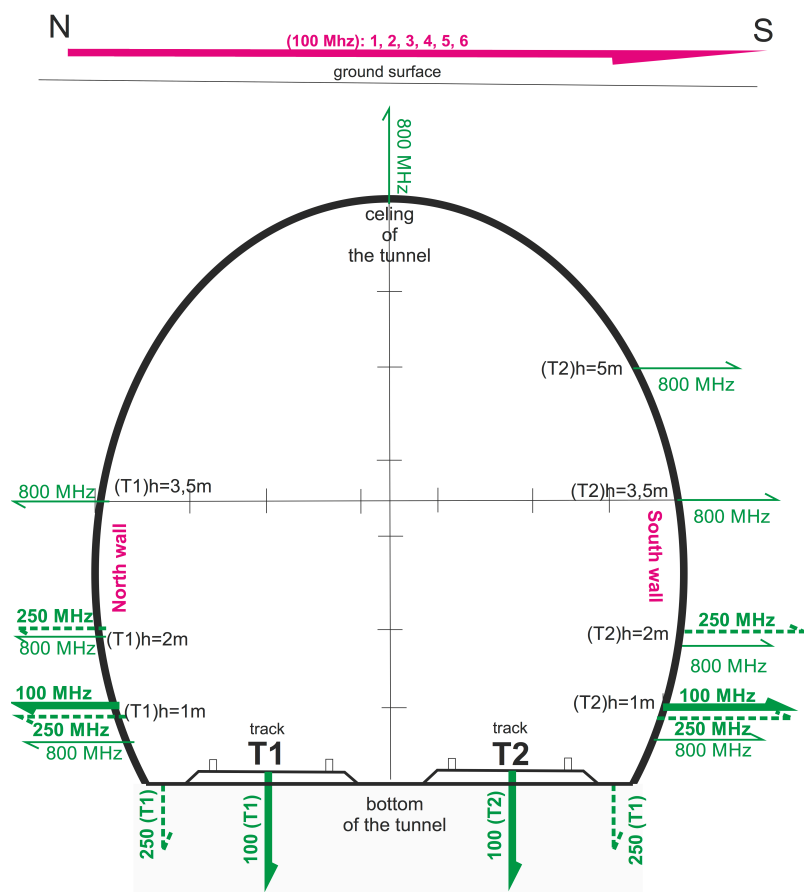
Location of GPR sections in Wojanów tunnel (schematic sketch).
